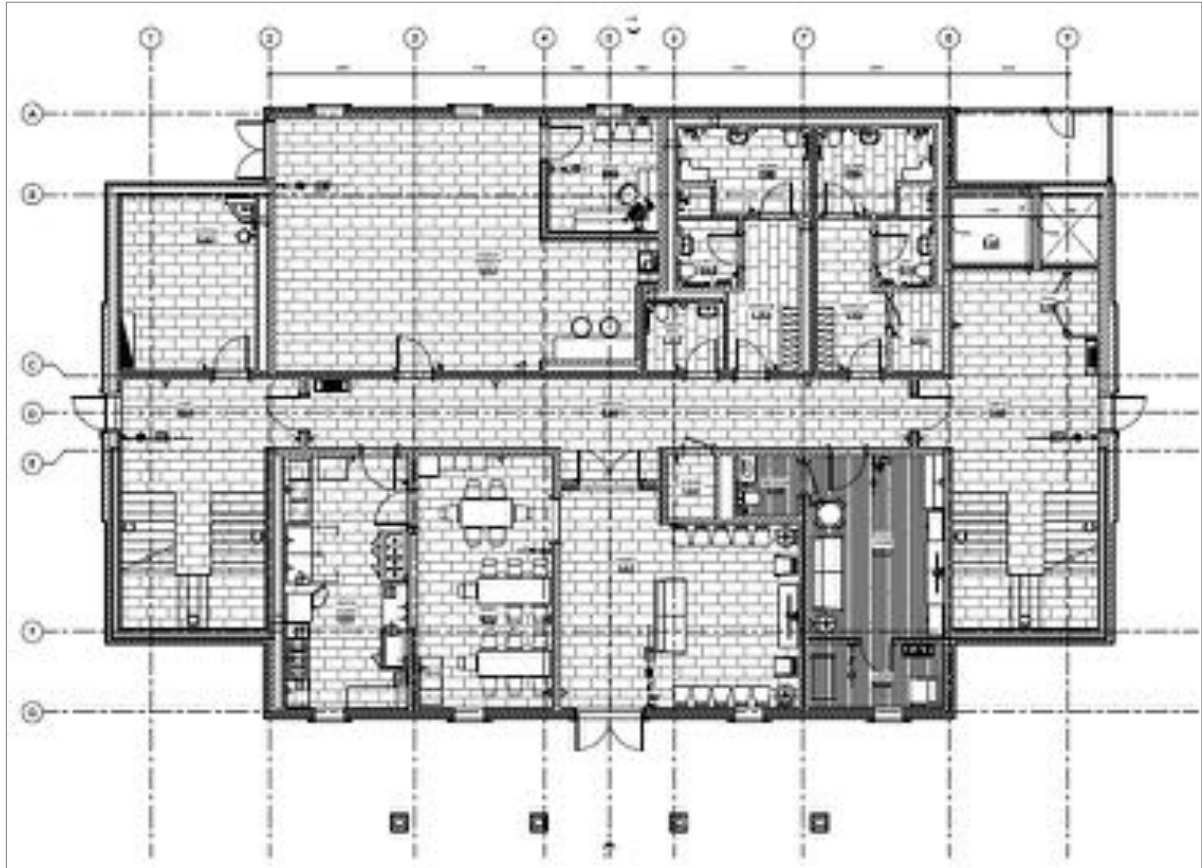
Arrival Centre – Ground Floor Plan
